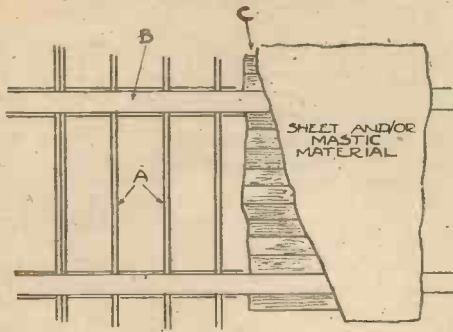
FLAT ROOF UNITS WITH SITE-APPLIED SHEET AND/OR MASTIC MATERIAL.
